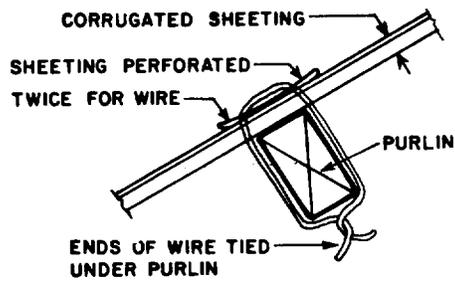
Details of corrugated sheet symmetrical fixing to purlins by wire.
